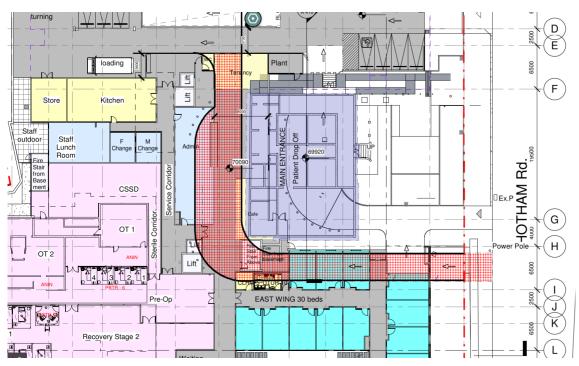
Ground floor plan with Hotham House and alternate driveway overlaid.
